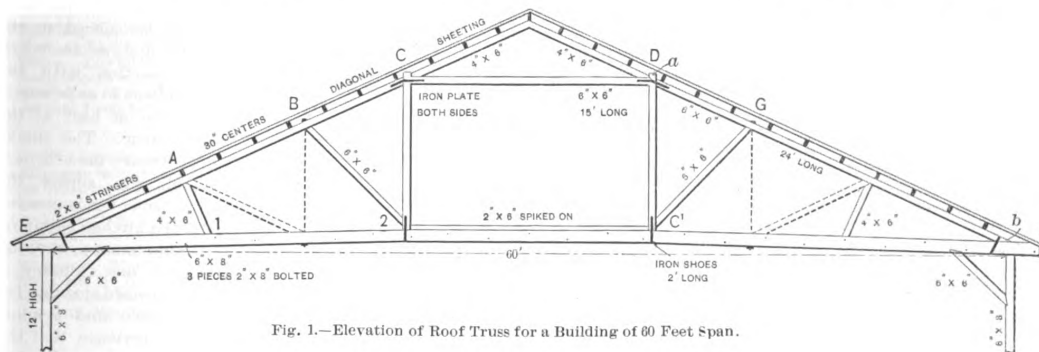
Elevation of Roof Truss for a Building of 60 Feet Span.
